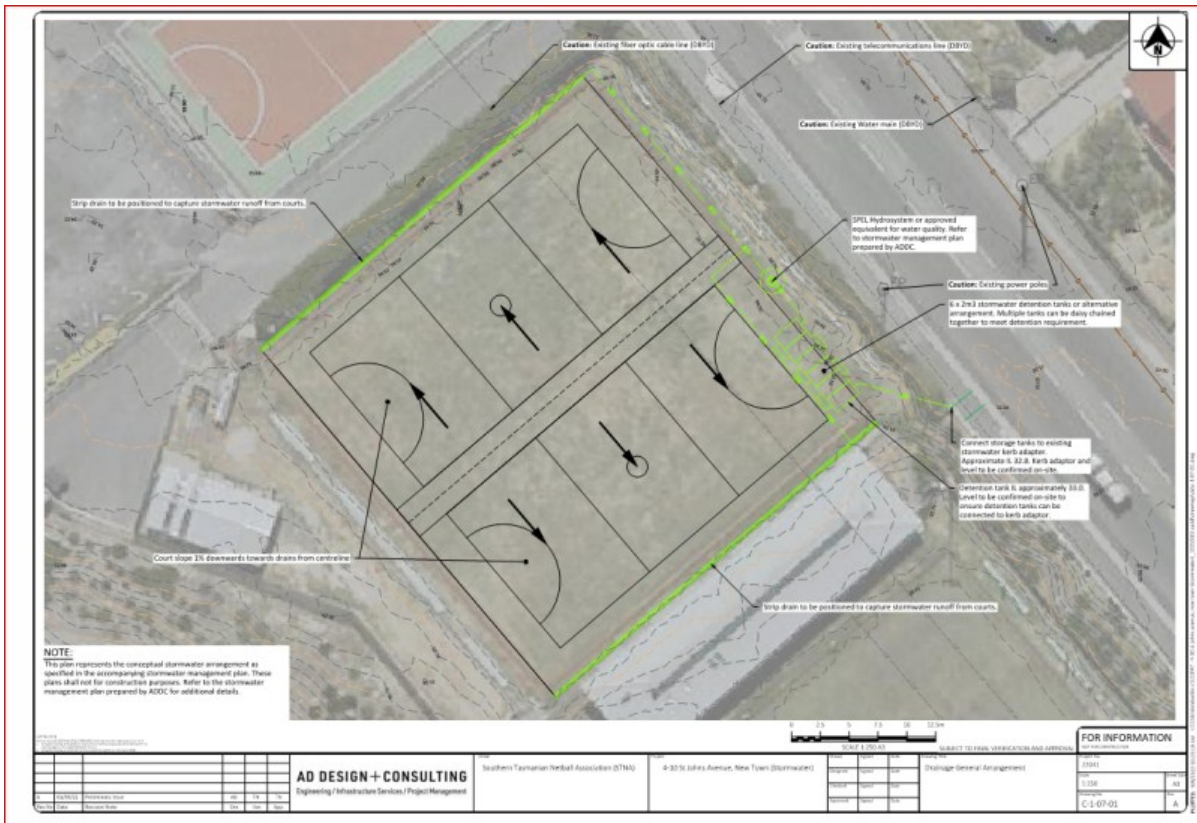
Site plan showing the layout of the proposed netball courts Source: Application
